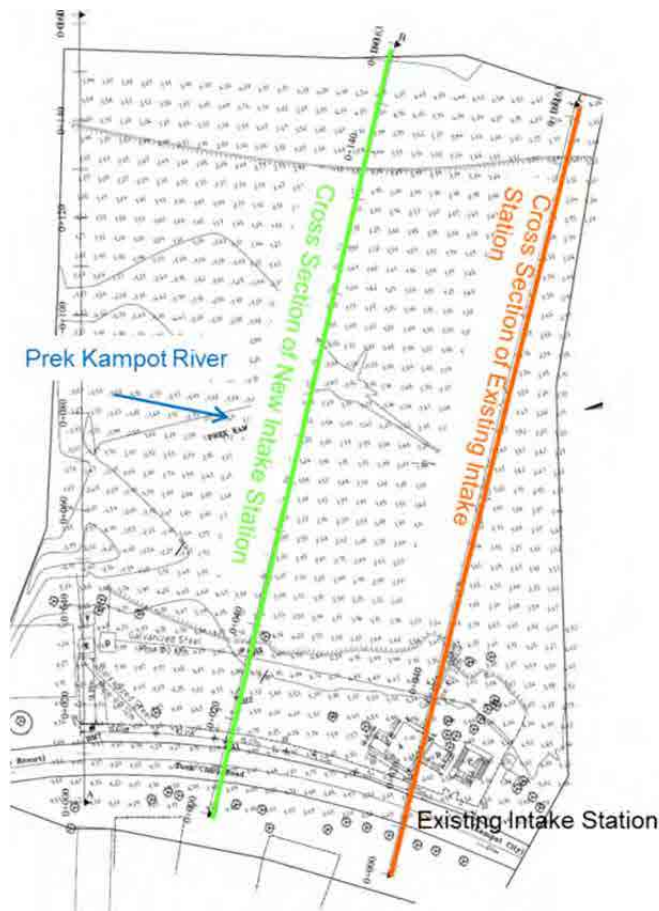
Cross Section Survey Lines of Existing and New Intake Station
